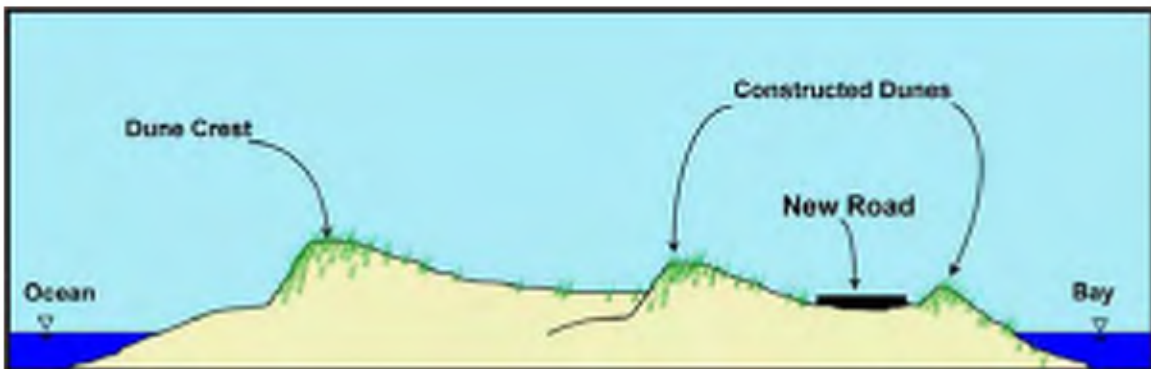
Schematic summarizing three approaches (bayward location, low elevation, constructed sand dunes near road) to minimize damage to roads that overwash.
